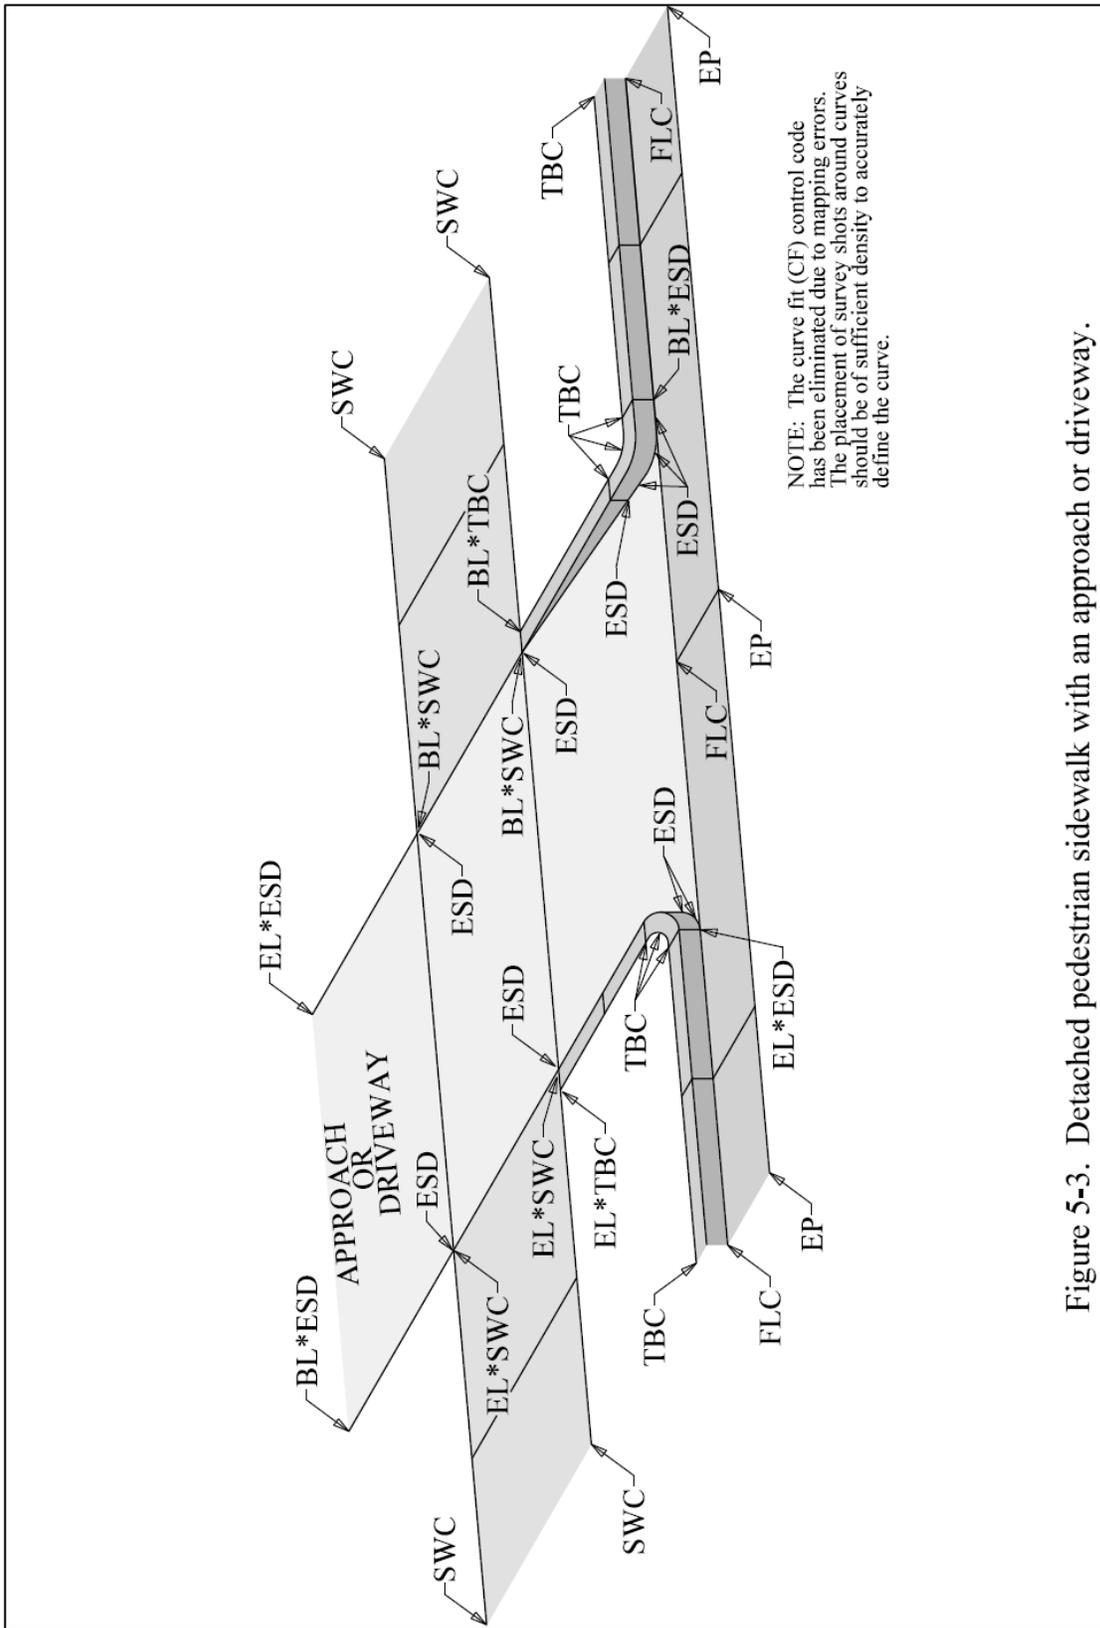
Detached pedestrian sidewalk with an approach or driveway.
